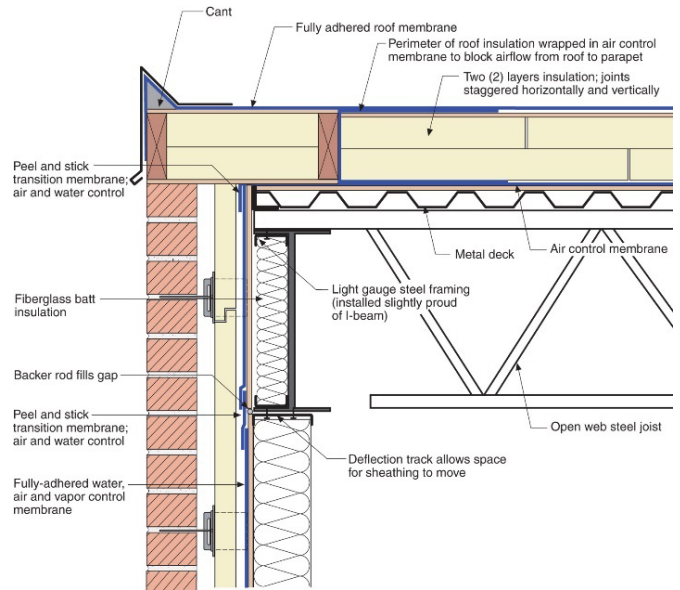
The Cantilevered Mini Parapet: Notice that air control layer continuity is achieved by wrapping the membrane over the building corner and then constructing the cantilevered portion of the parapet over the top of this air seal.
